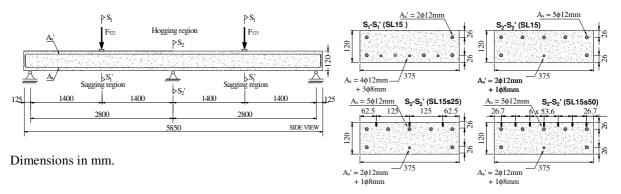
SL15 series slab strips: Test configuration, cross-sectional dimensions and steel and CFRP arrangements.
